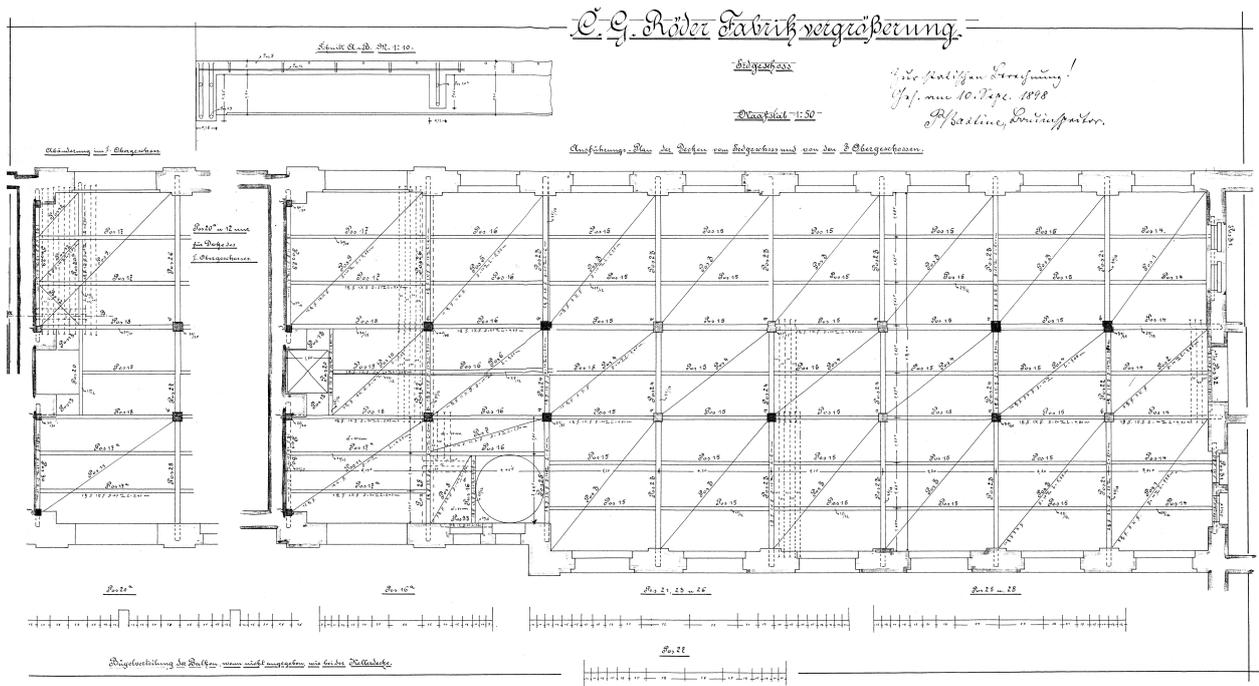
Reinforcement plan of the ground floor ceiling drawn by Martenstein & Josseaux; (Bauakte, p. 144)
